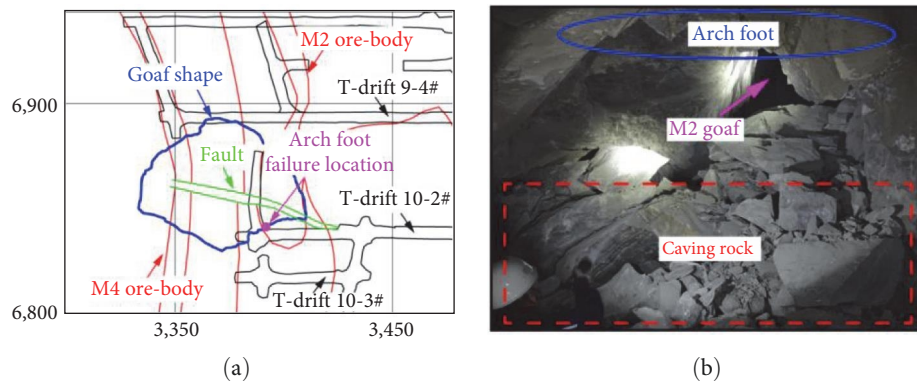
Arch foot failure of the caving goaf at the -195 m level: (a) location of arch foot failure; (b) site diagram of arch foot failure.
